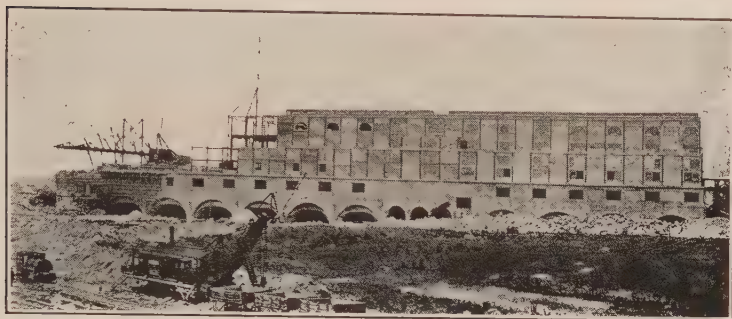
DOWNSTREAM SIDE OF THE POWER HOUSE, CEDARS RAPIDS
